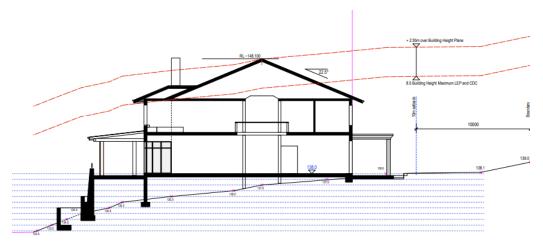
Section extract showing extent of 8.5 metre building height breach
